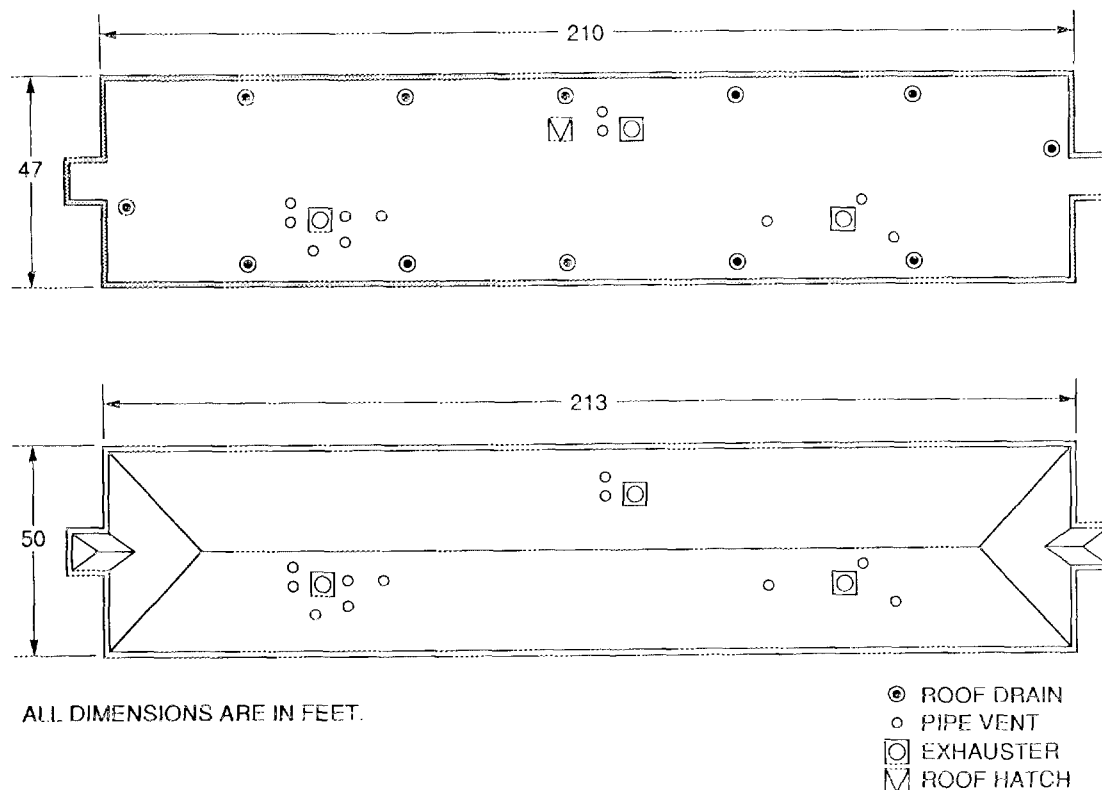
Roof plans for Airmen's Dormitory, Anywhere Air Force Base.
